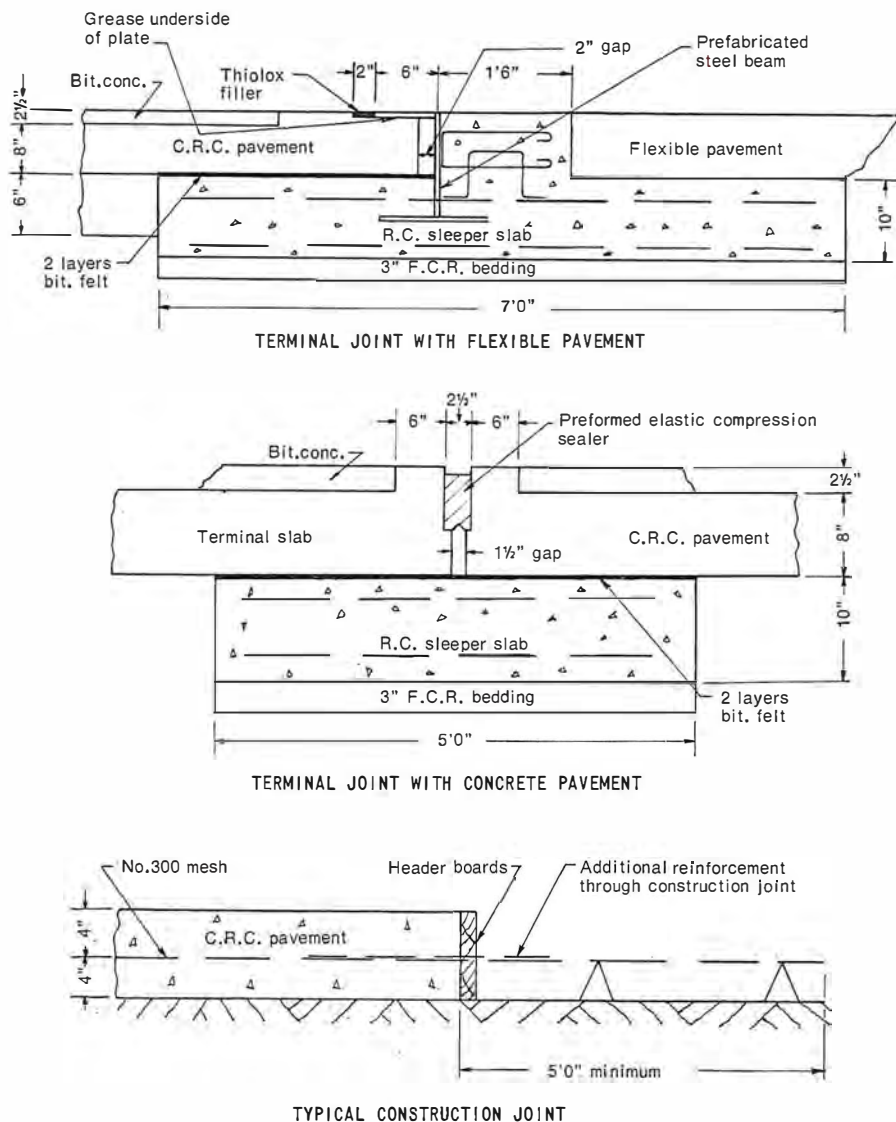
C.R.C. pavement. Details of terminal joints and a construction joint.
